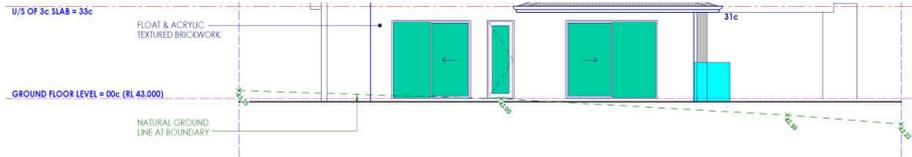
Screen shot of Elevation 3-4 showing floor level and natural ground level difference greater than 0.5m
